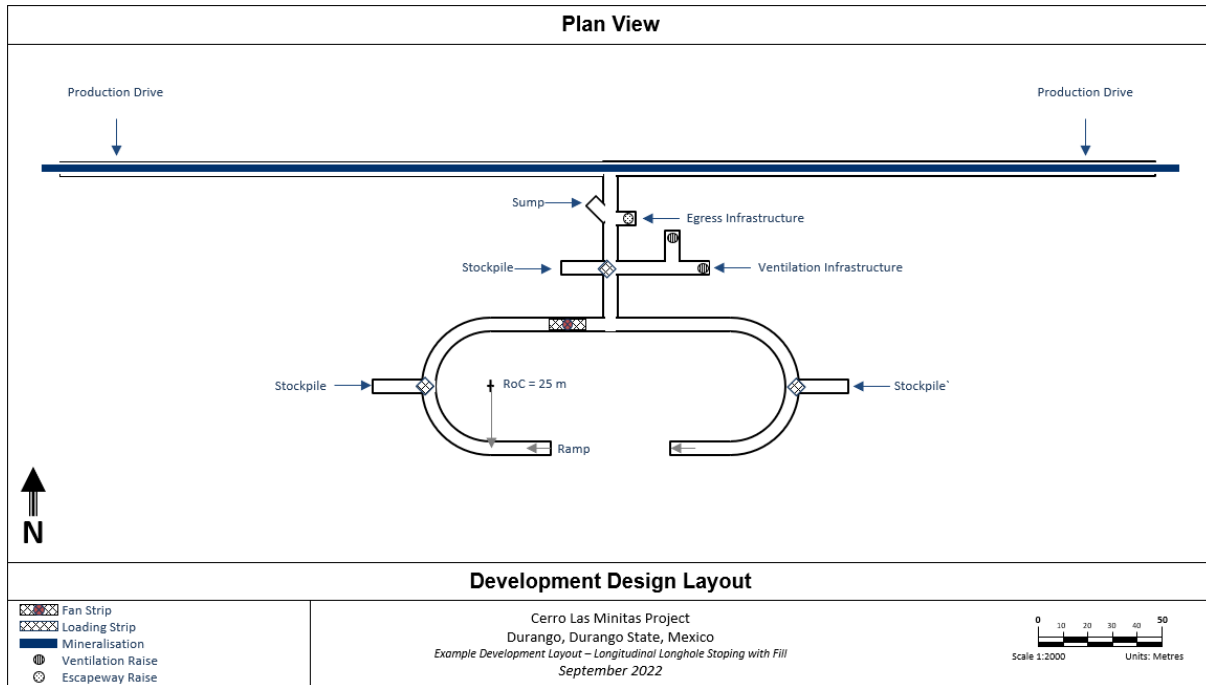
Cerro Las Minitas Longitudinal Longhole Stopping Level Layout
